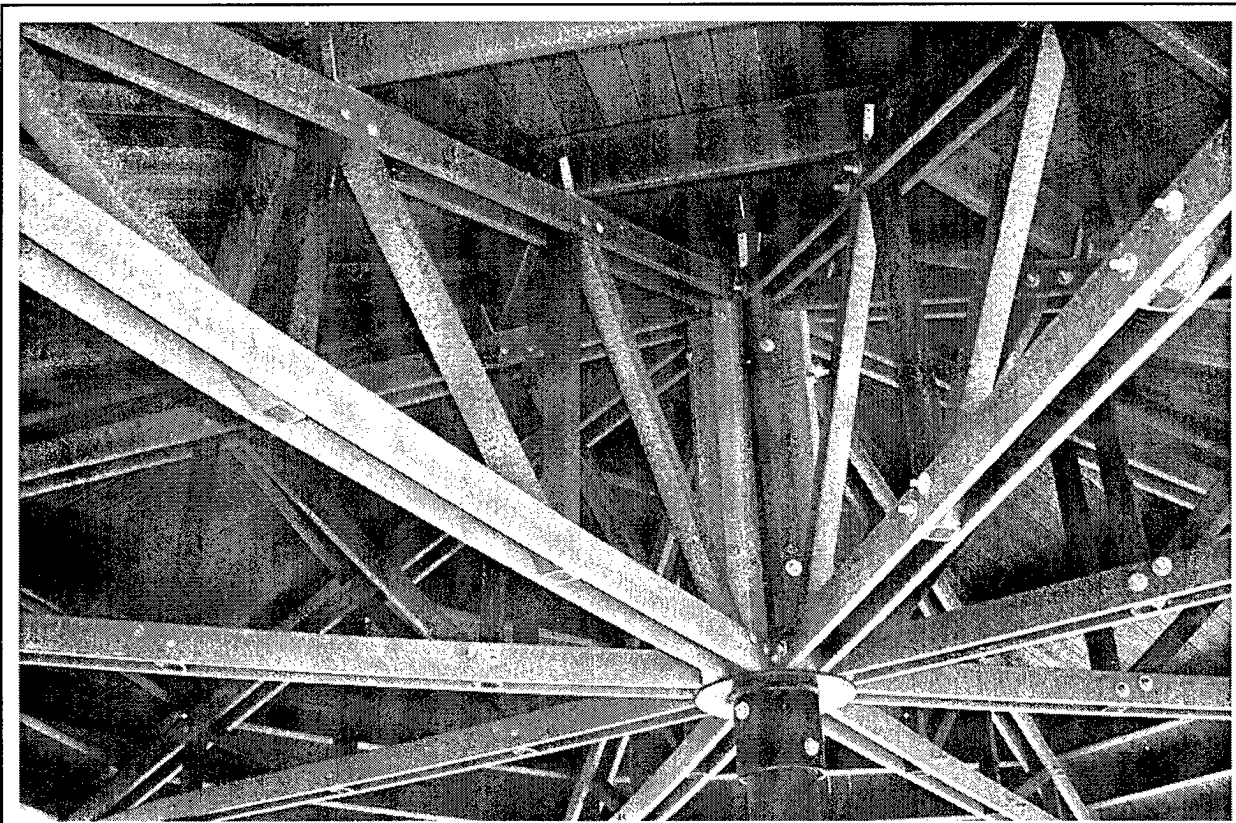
Structural trusses for the gazebo roof at Tiffany Street Pier.
